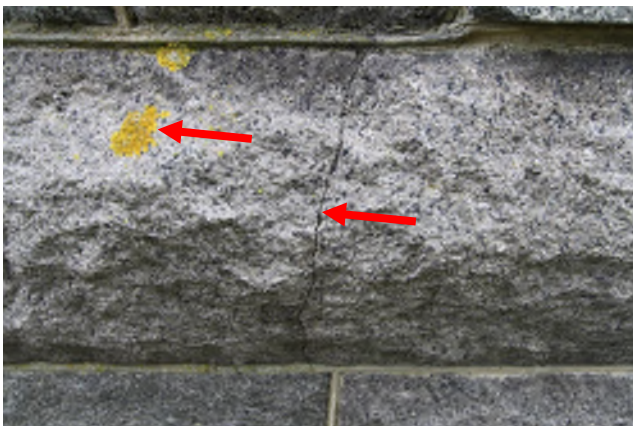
Cracked rock-faced granite element. Note the vegetative growth on the wall.
